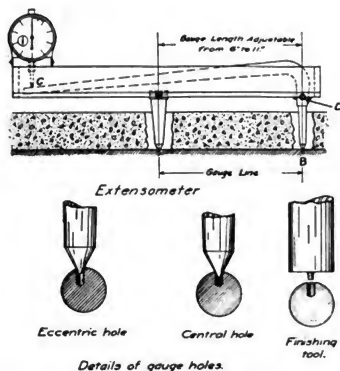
DETAIL OF EXTENSOMETER AND GAUGE HOLES.
